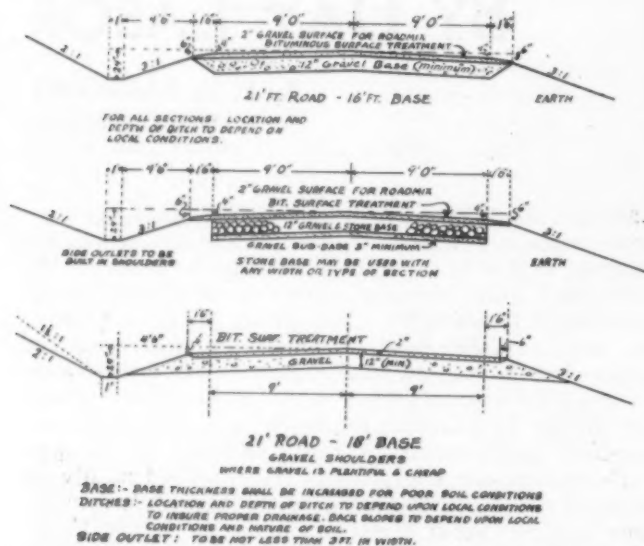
Typical Cross Sections of State Aid Road Work.
